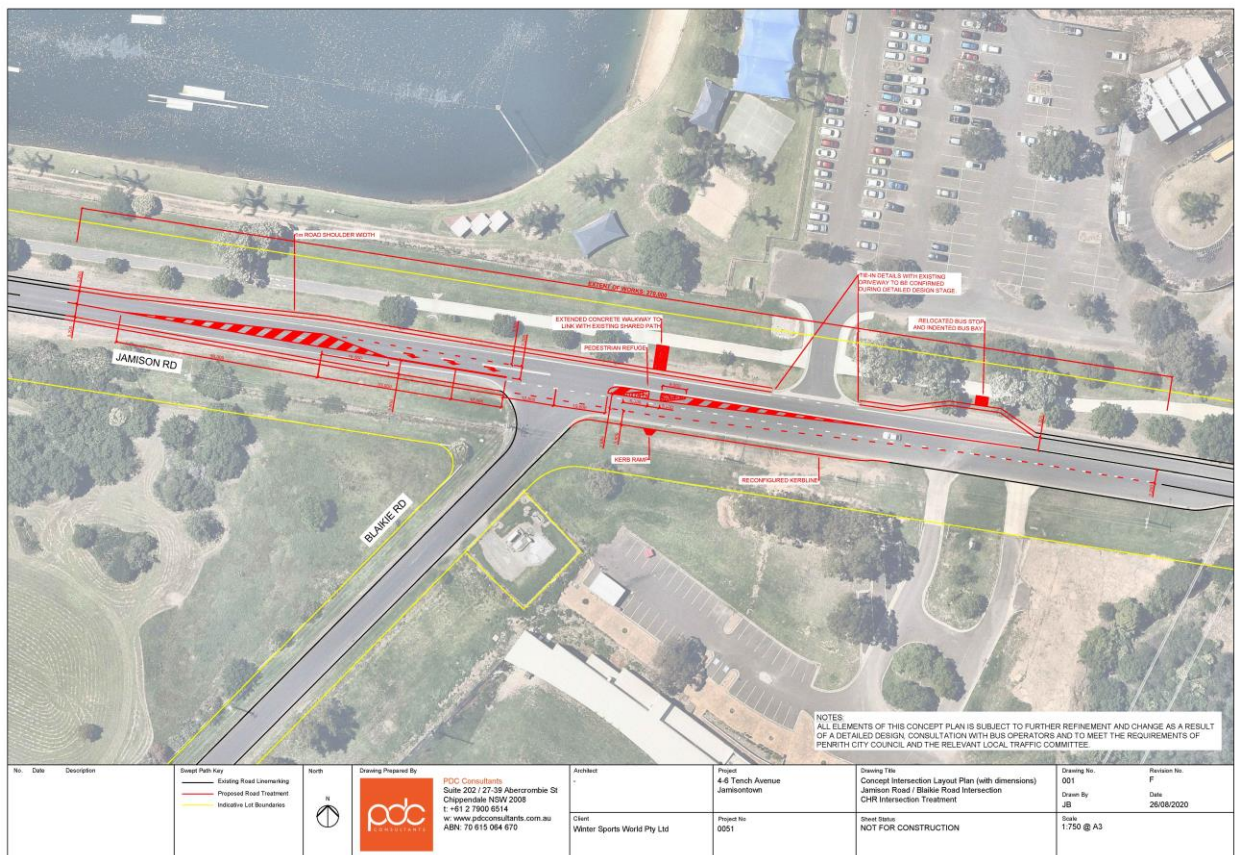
Upgraded layout of the Jamison Road and Blake Road intersection with the CHR treatment
